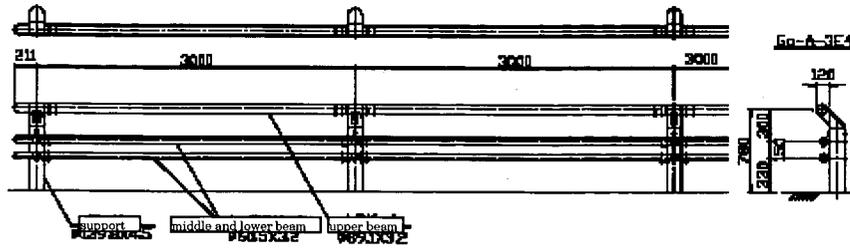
Structure of the test specimen (Test No.1,2,3)
